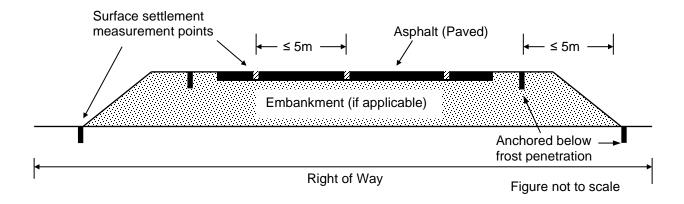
Typical configuration of surface settlement monitoring points along the tunnel alignment.
